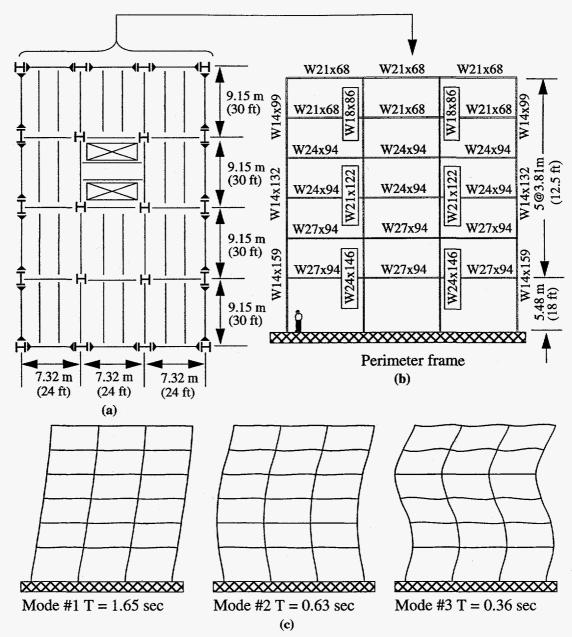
Six story steel frame building. (a) plan dimension; (b) end perimeter frame details; (c) natural modeshapes of the building in the short direction.
